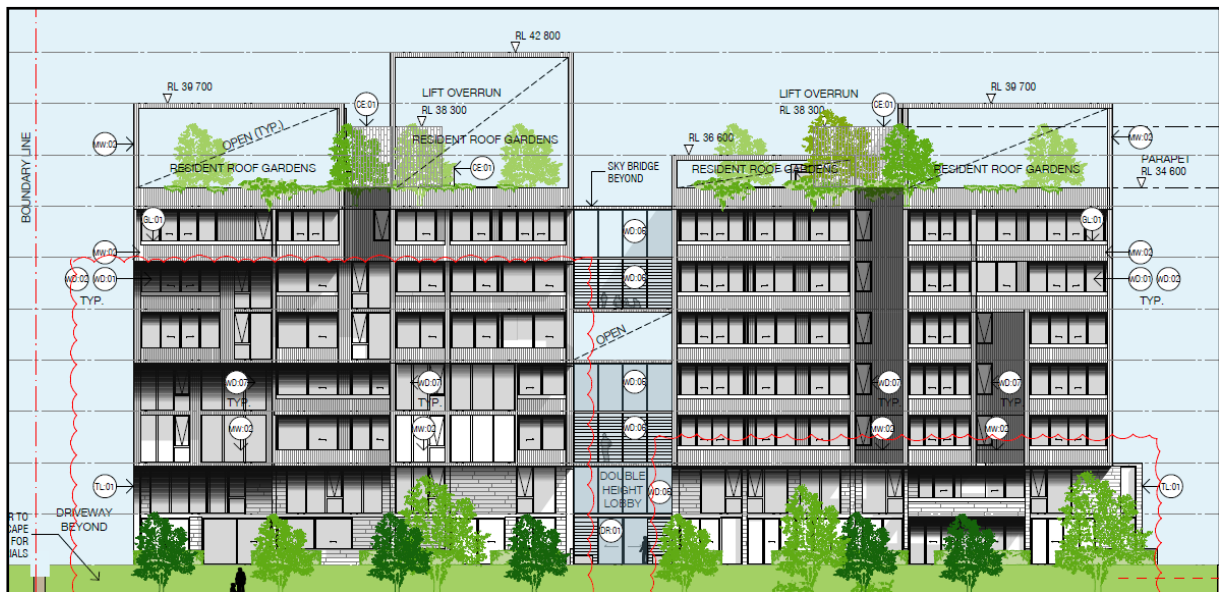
View of Building C1 from Georges River (source Woods Bagot)
